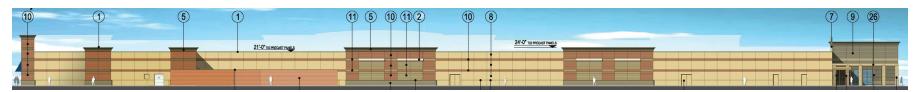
Wal-mart Royal West Drive Rear (East) Elevation
